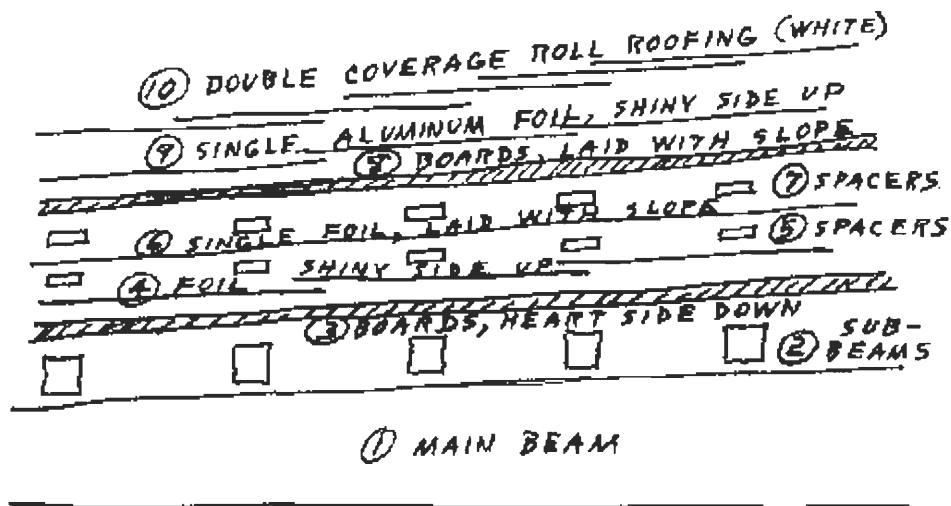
Cross-section of a roof illustrating the various layers for support and insulation.
